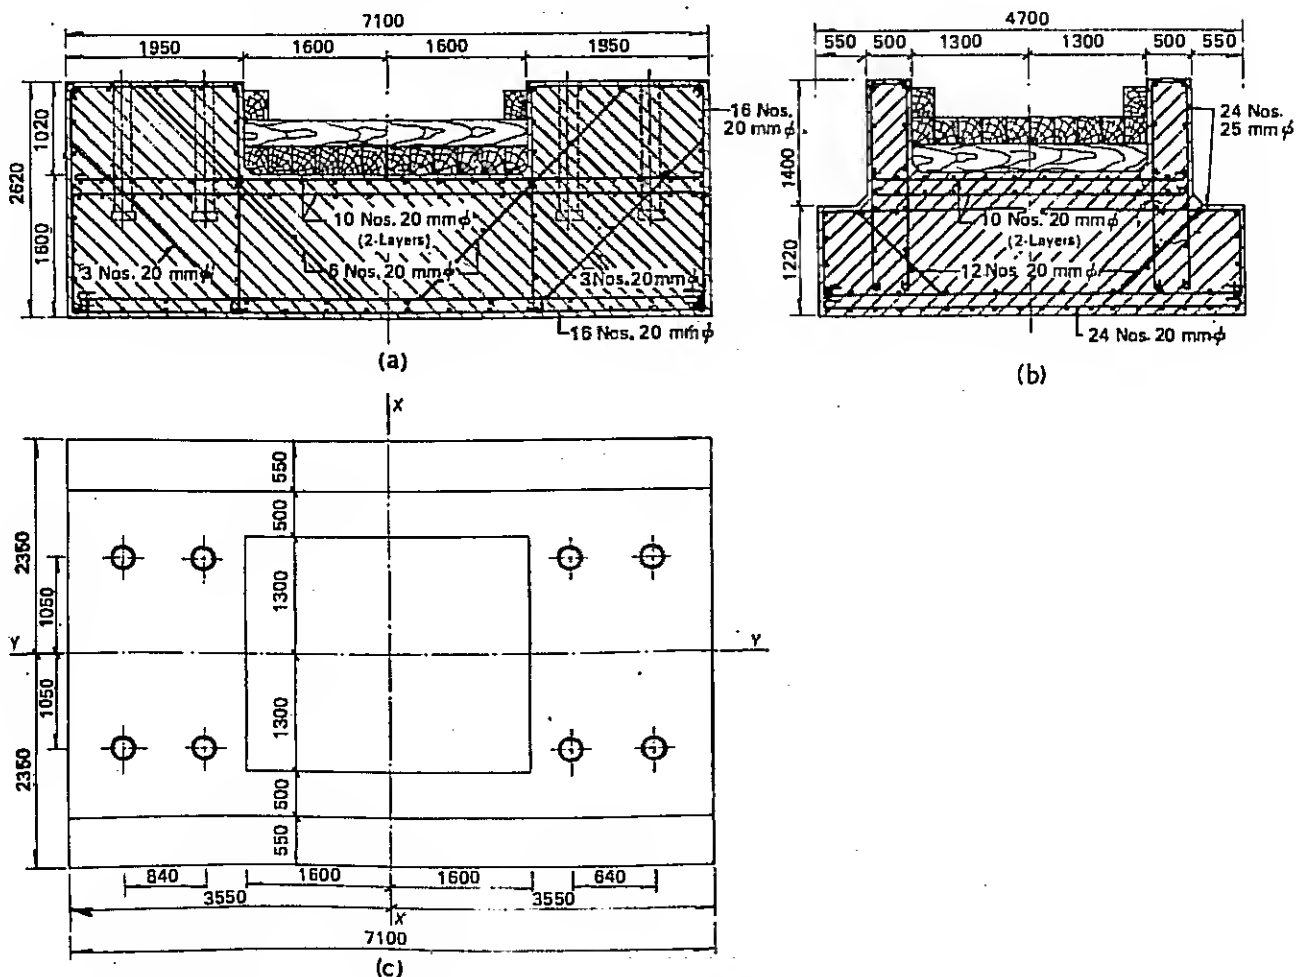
Foundation for a 3.4 t Forge Hammer—(a) Section y-y, (b) Section x-x, (c) Plan.
